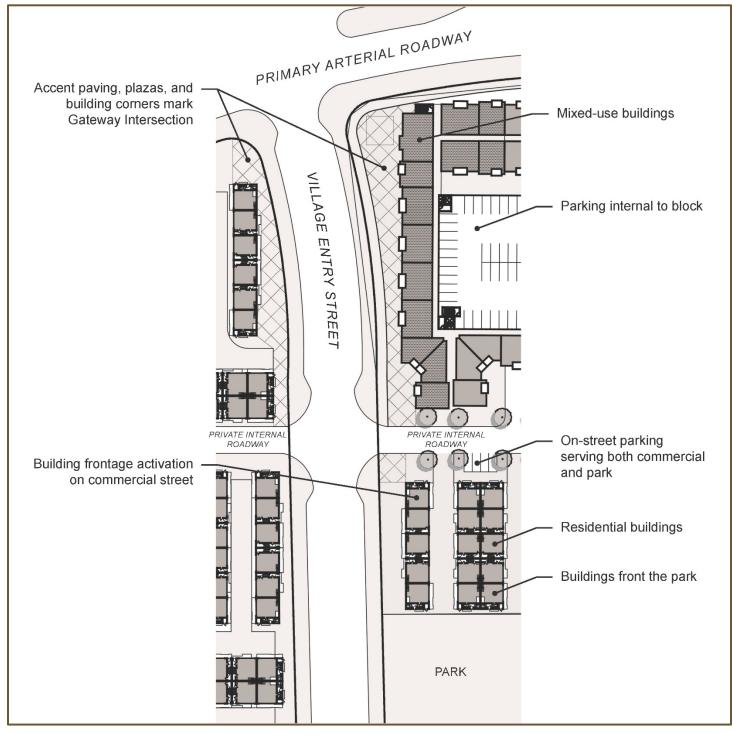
Mixed Use Development Clustered Around Gateway Intersection
